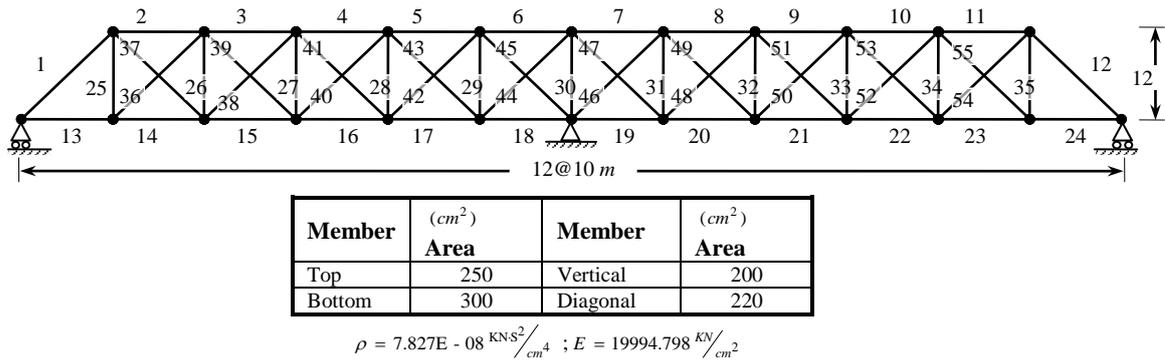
Cross-sectional properties and the layout of bridge truss.
